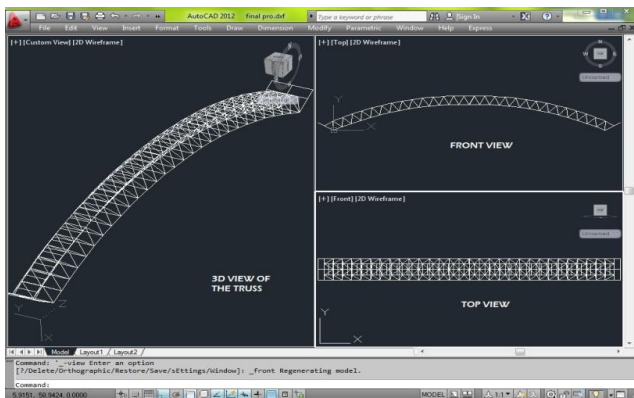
Views of the Single Roof truss which is imported into STAAD Pro
